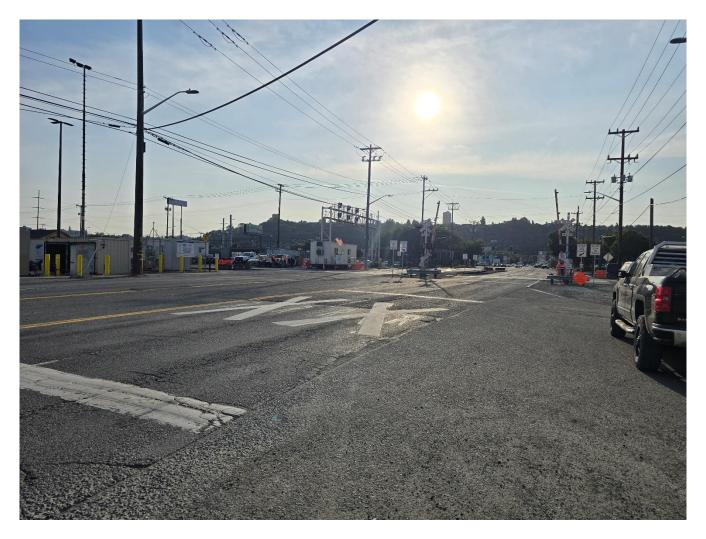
S HOLGATE ST AND DOT# 085583Y CROSSING, PAVEMENT CONDITION SHOWING ALLIGATORING OF PAVEMENT AND LATERAL CRACKING, SE CORNER LOOKING NE
